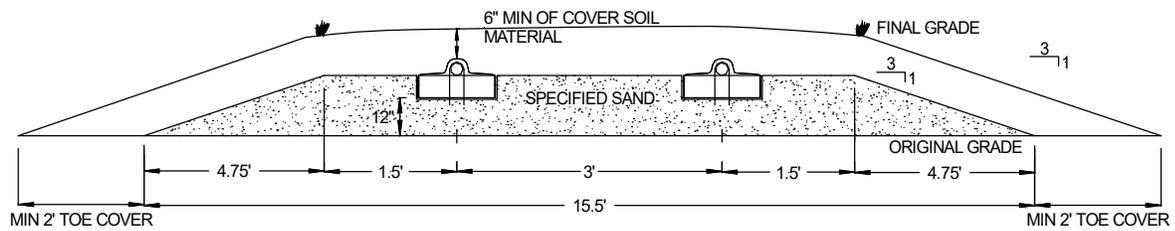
CROSS SECTION VIEW – BED SYSTEM – LEVEL SITE
